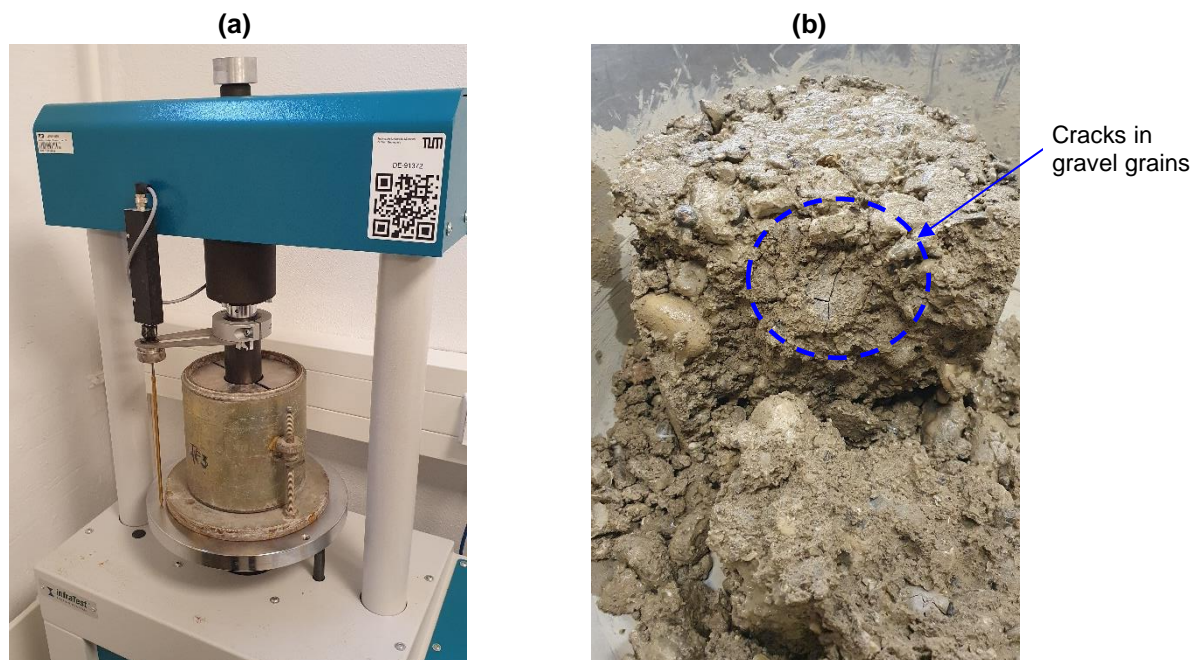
(a) CBR test conducted on road shoulder material (b) disassembled GU055 specimen showing cracks
